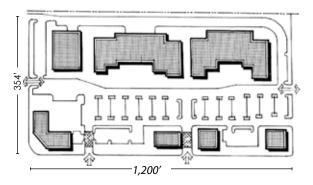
This site plan example depicts an approximate 10 acre site with 42% freestanding "pad" building frontage
